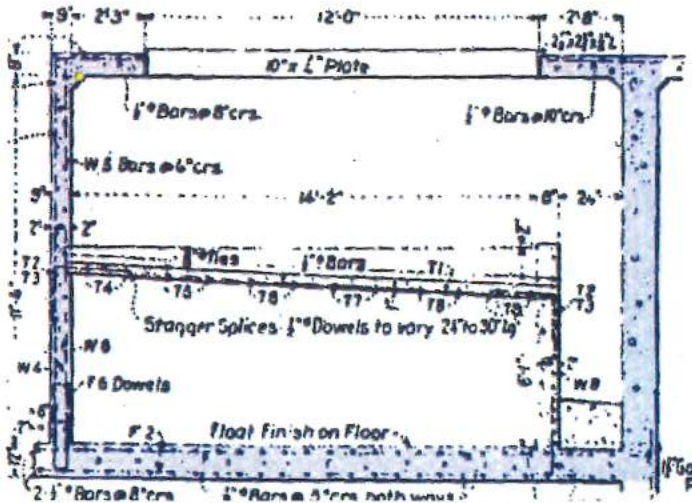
Section Showing Cantilever First Floor Slabs at Filter Beds (left)
